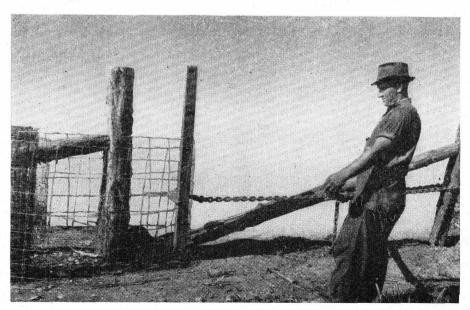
Stretching a fence with a single-jack stretcher.
